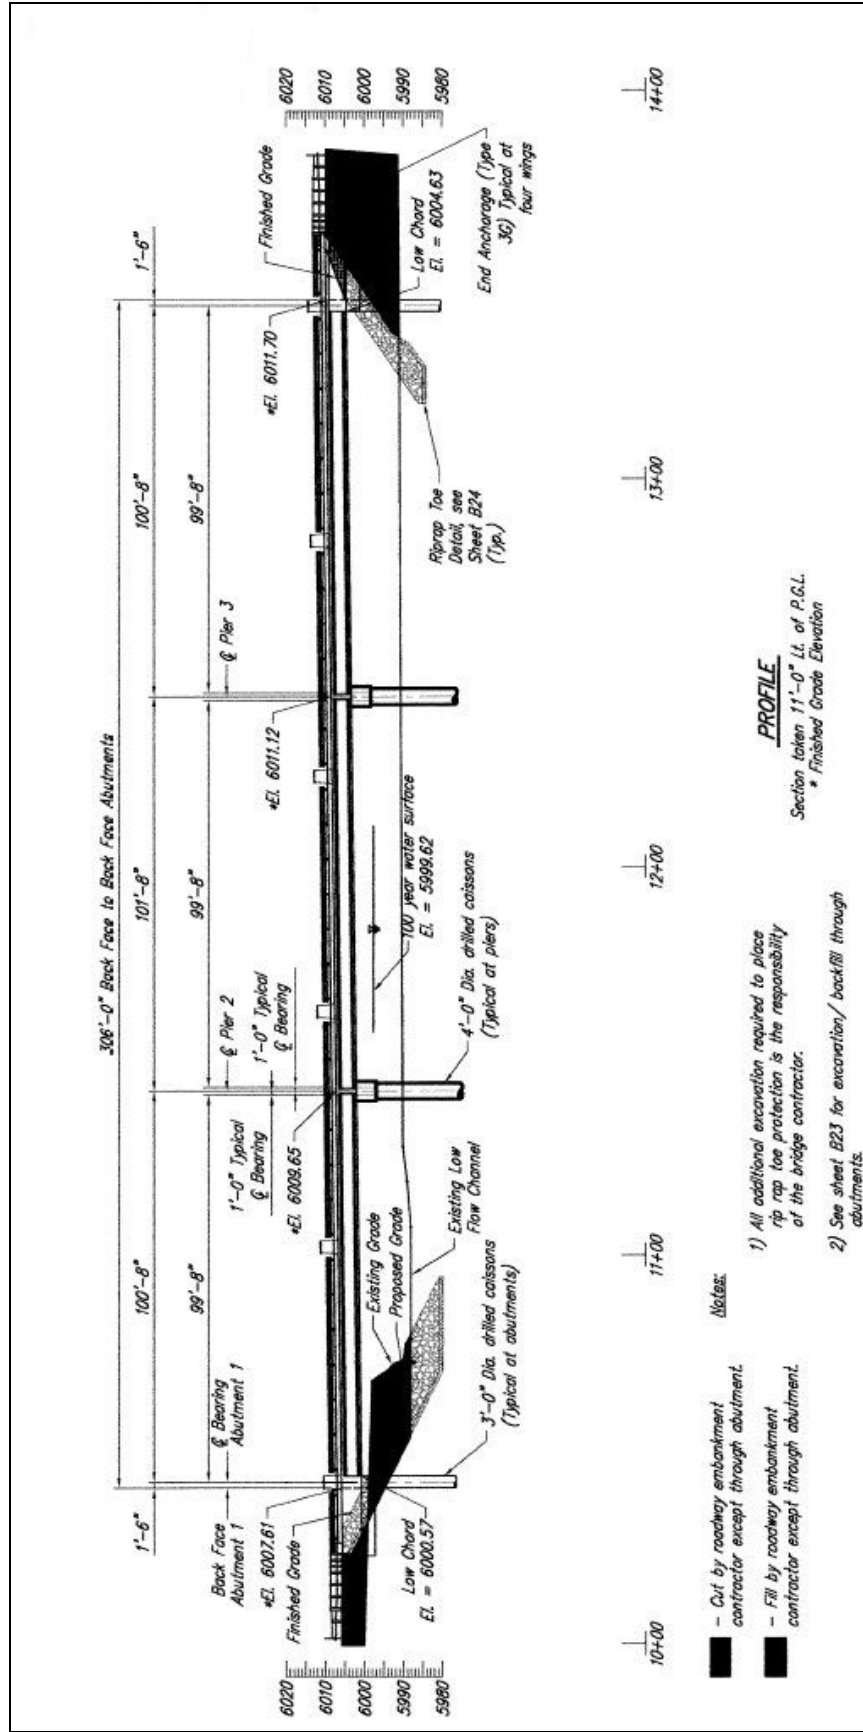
East Bayou Gulch Road Bridge (formerly Chambers Parkway Bridge) over Cherry Creek: Schematic excerpted from Record Drawing Sheet B3-b; Douglas County Department of Public Works, Engineering Division
